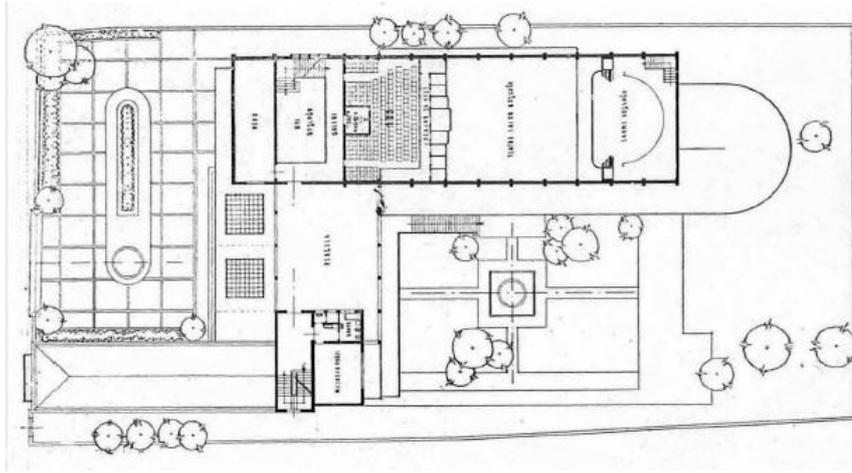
Ground plan Kadıköy People's House (1938).³⁰²
